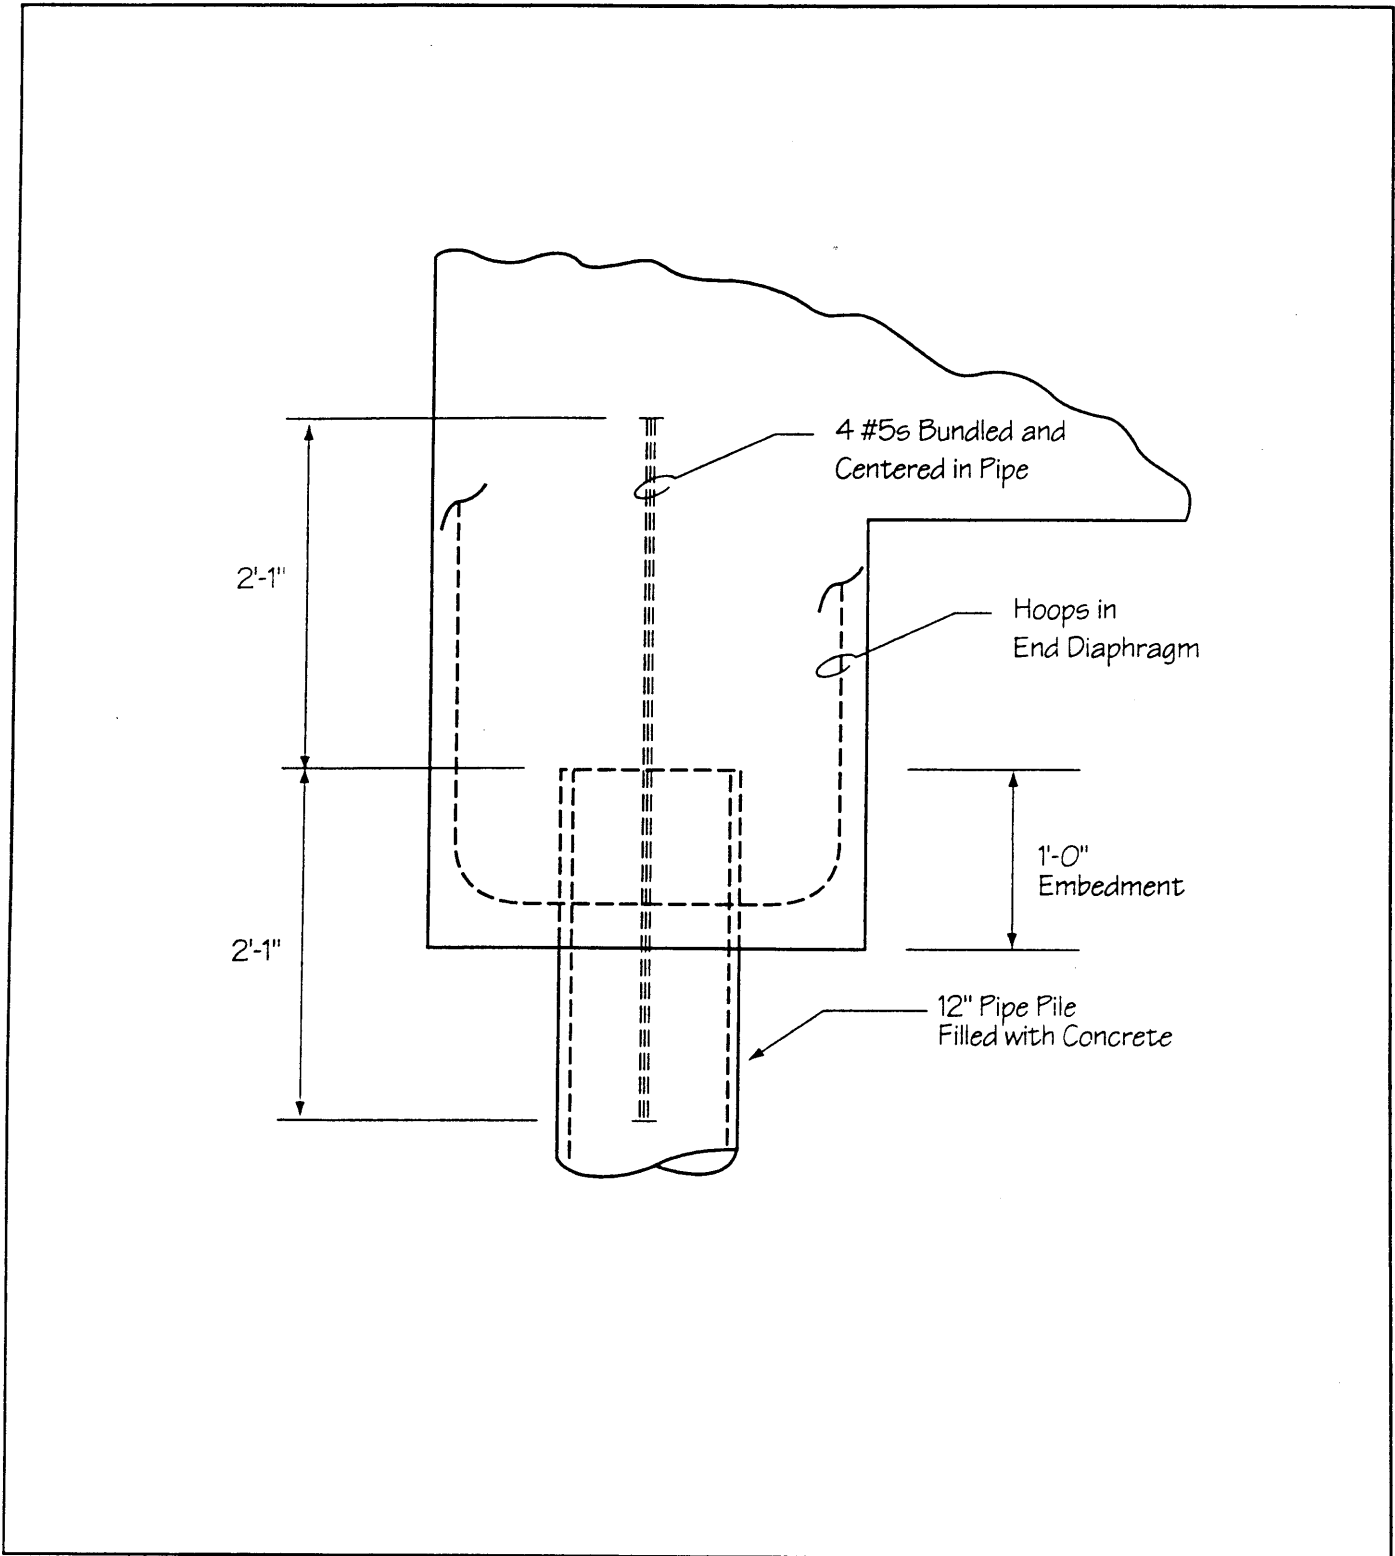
Pipe Pile to End Diaphragm Connection Details
